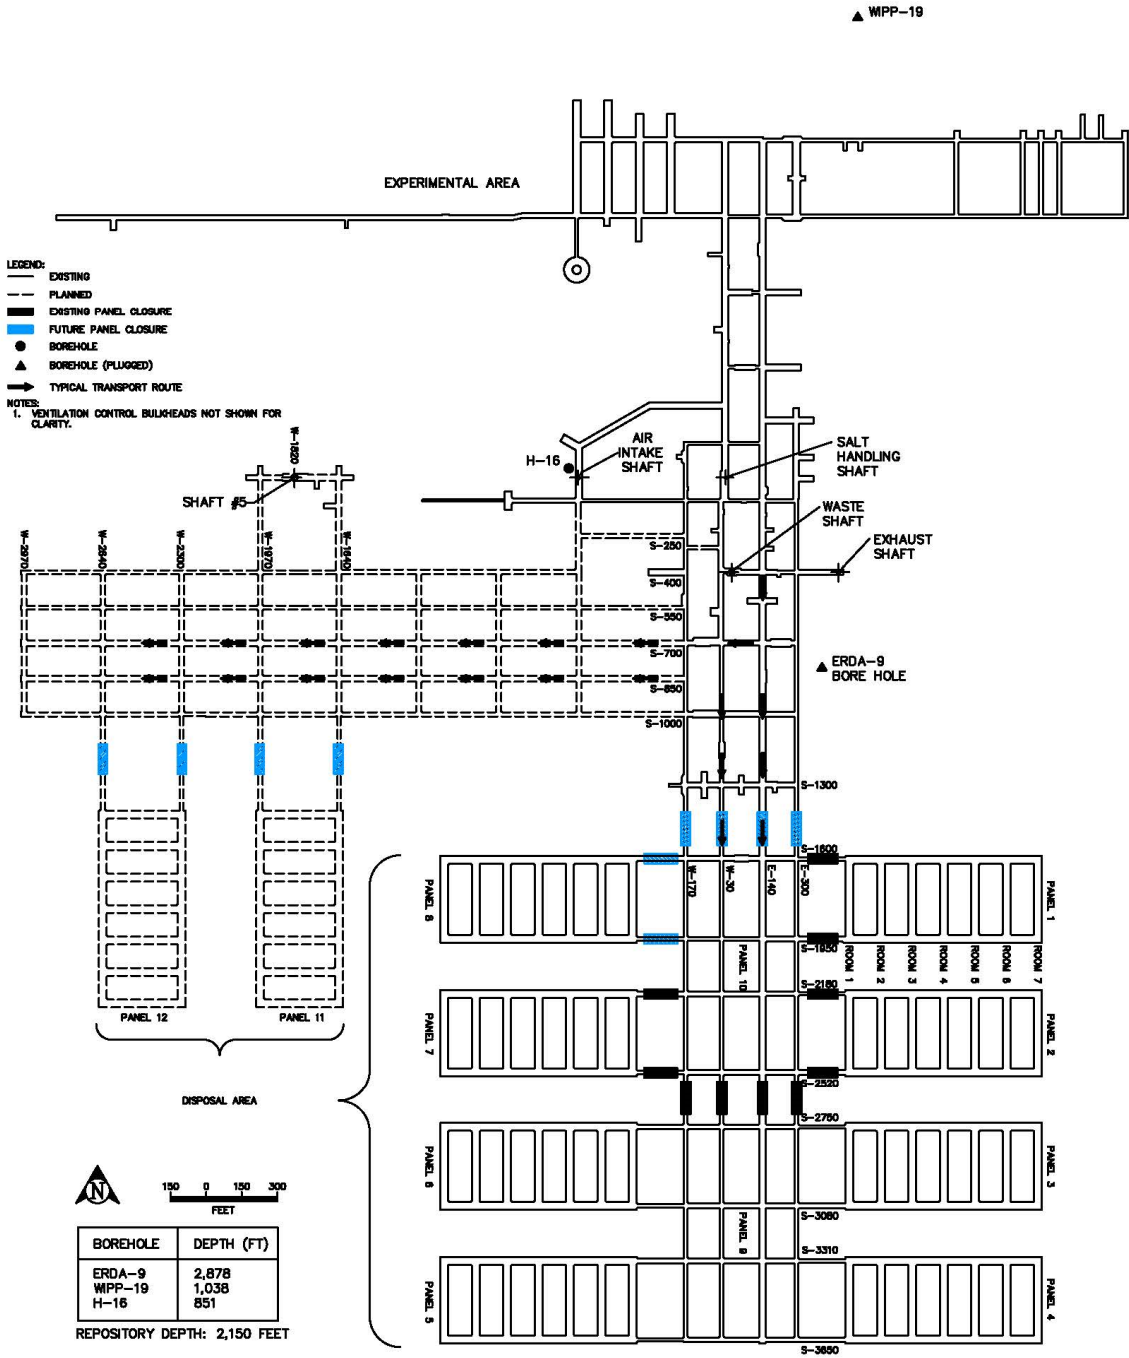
Layout of Proposed Replacement Panels 11 and 12 (NMED 2023)
